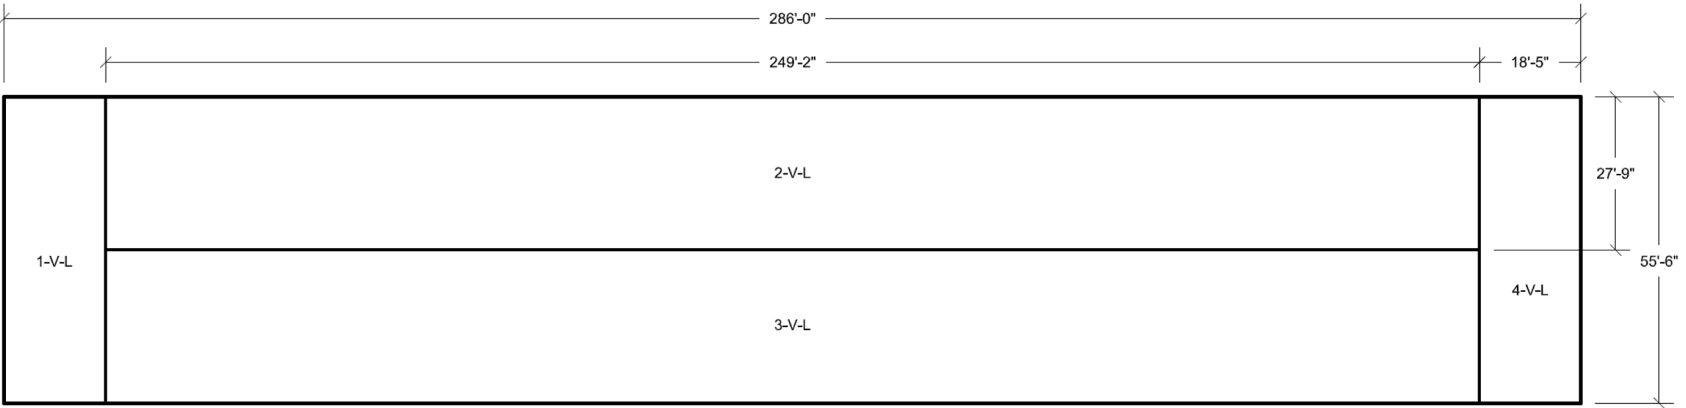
H.6-111 Cooling Tower North (and South) Wall Looking South (North)
